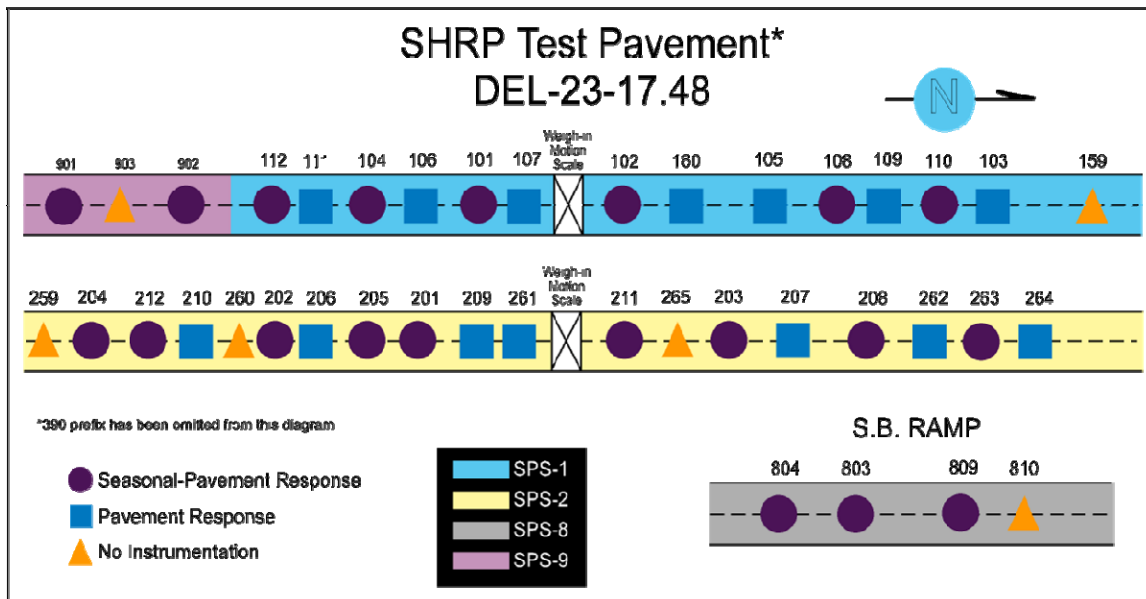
Sections of SPS1, SPS2, SPS8, and SPS9 in Ohio SHRP Test Road (Sargand, 1994).
